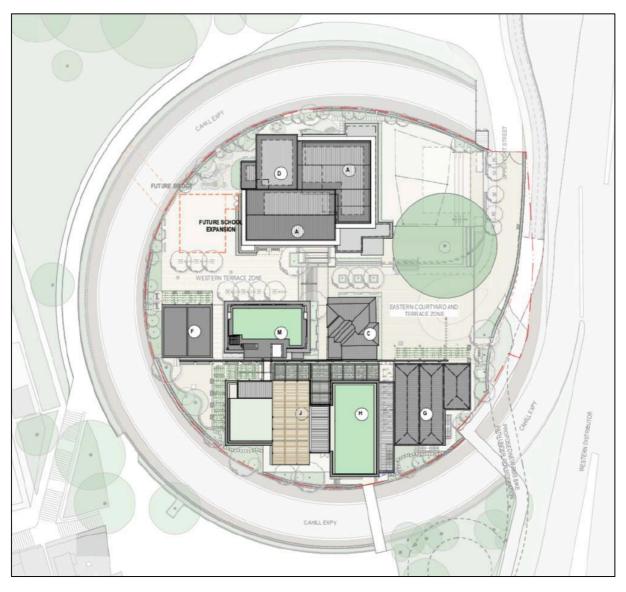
Proposed Site Plan- Buildings Labelled (Source: FJMT 2019, DWG DA-1211, SSDA01, 18.12.19)
